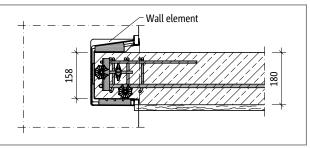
Schöck Tronsole® type Z: Wall element as stay-in-place formwork; underside of the landing flush with the connection frame of the wall element
